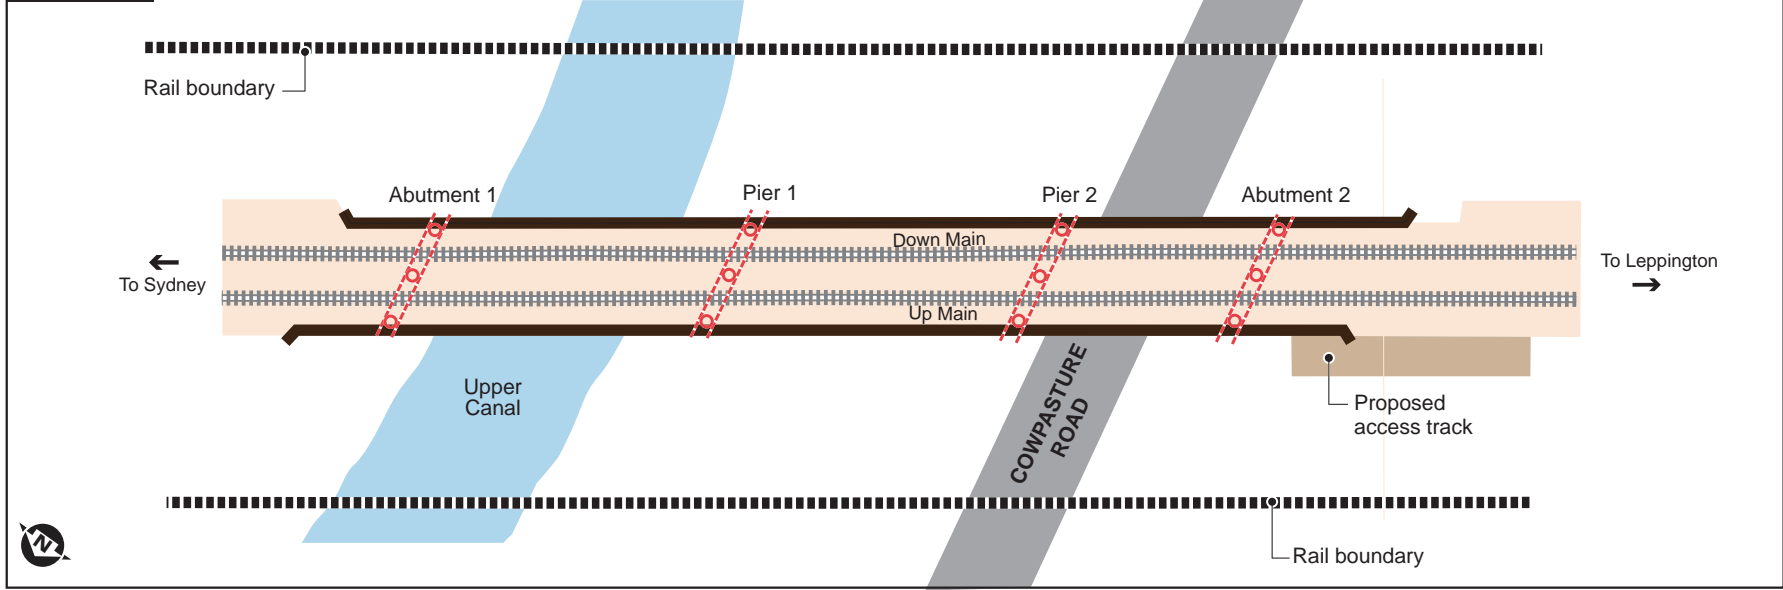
Upper Canal and Cowpasture Road underbridge
